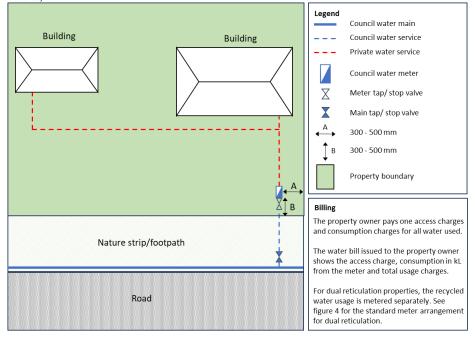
Alternative meter arrangement - Secondary dwelling with combined water use
